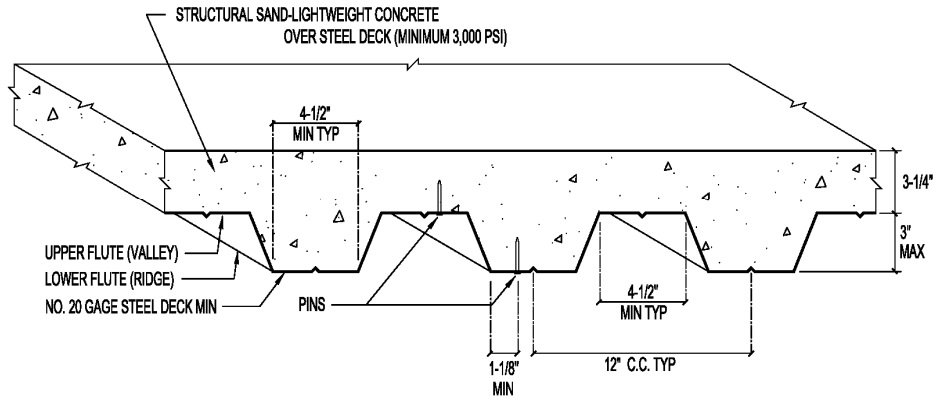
A—FASTENER INSTALLATION IN UPPER AND LOWER FLUTES OF 3-INCH-DEEP STEEL DECK PROFILES
